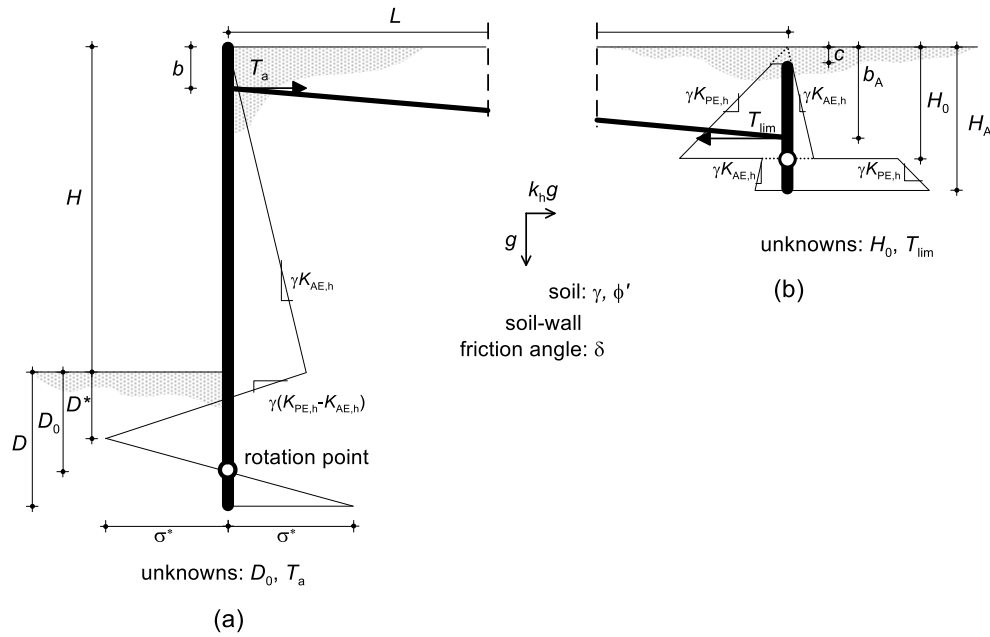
Typical layout of an ASSP wall and earth pressure distributions assumed in the proposed pseudo-static limit equilibrium method: (a) main wall and (b) anchor plate.
